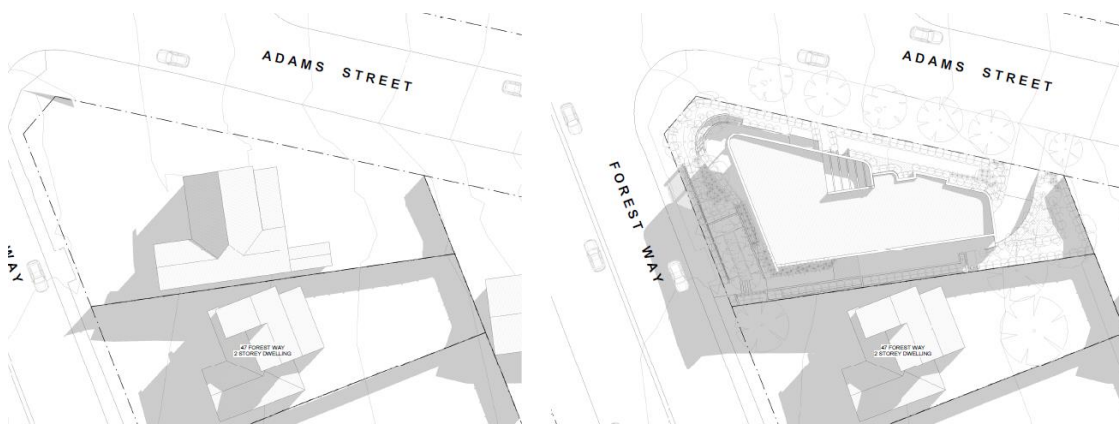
the existing and proposed shading impact to the southern adjoining development at 9am
